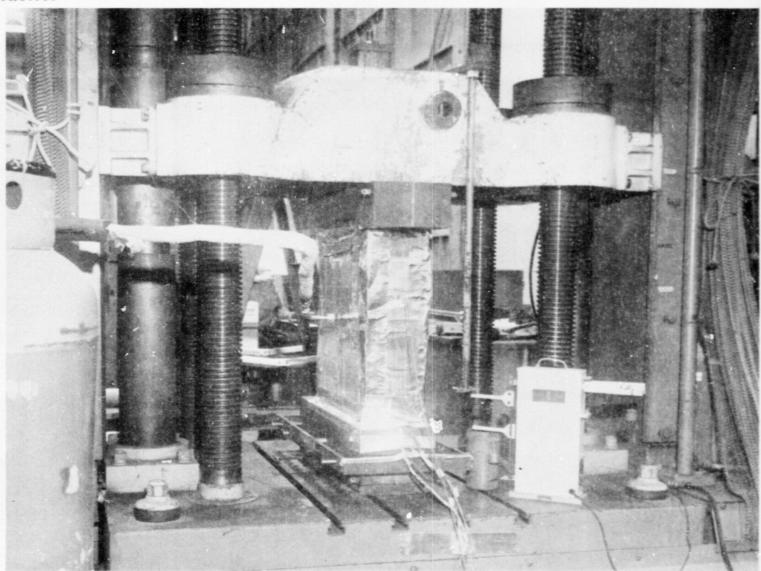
Typical Test Set-up for -132 C (-270 F) Compression Element Test
